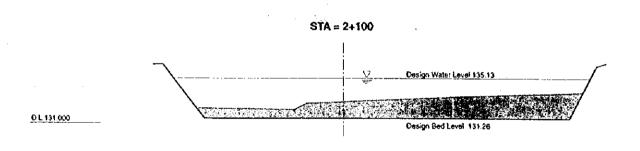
Cross Section of D.G. Khan Canal at Taunsa Barrage (3/4)
